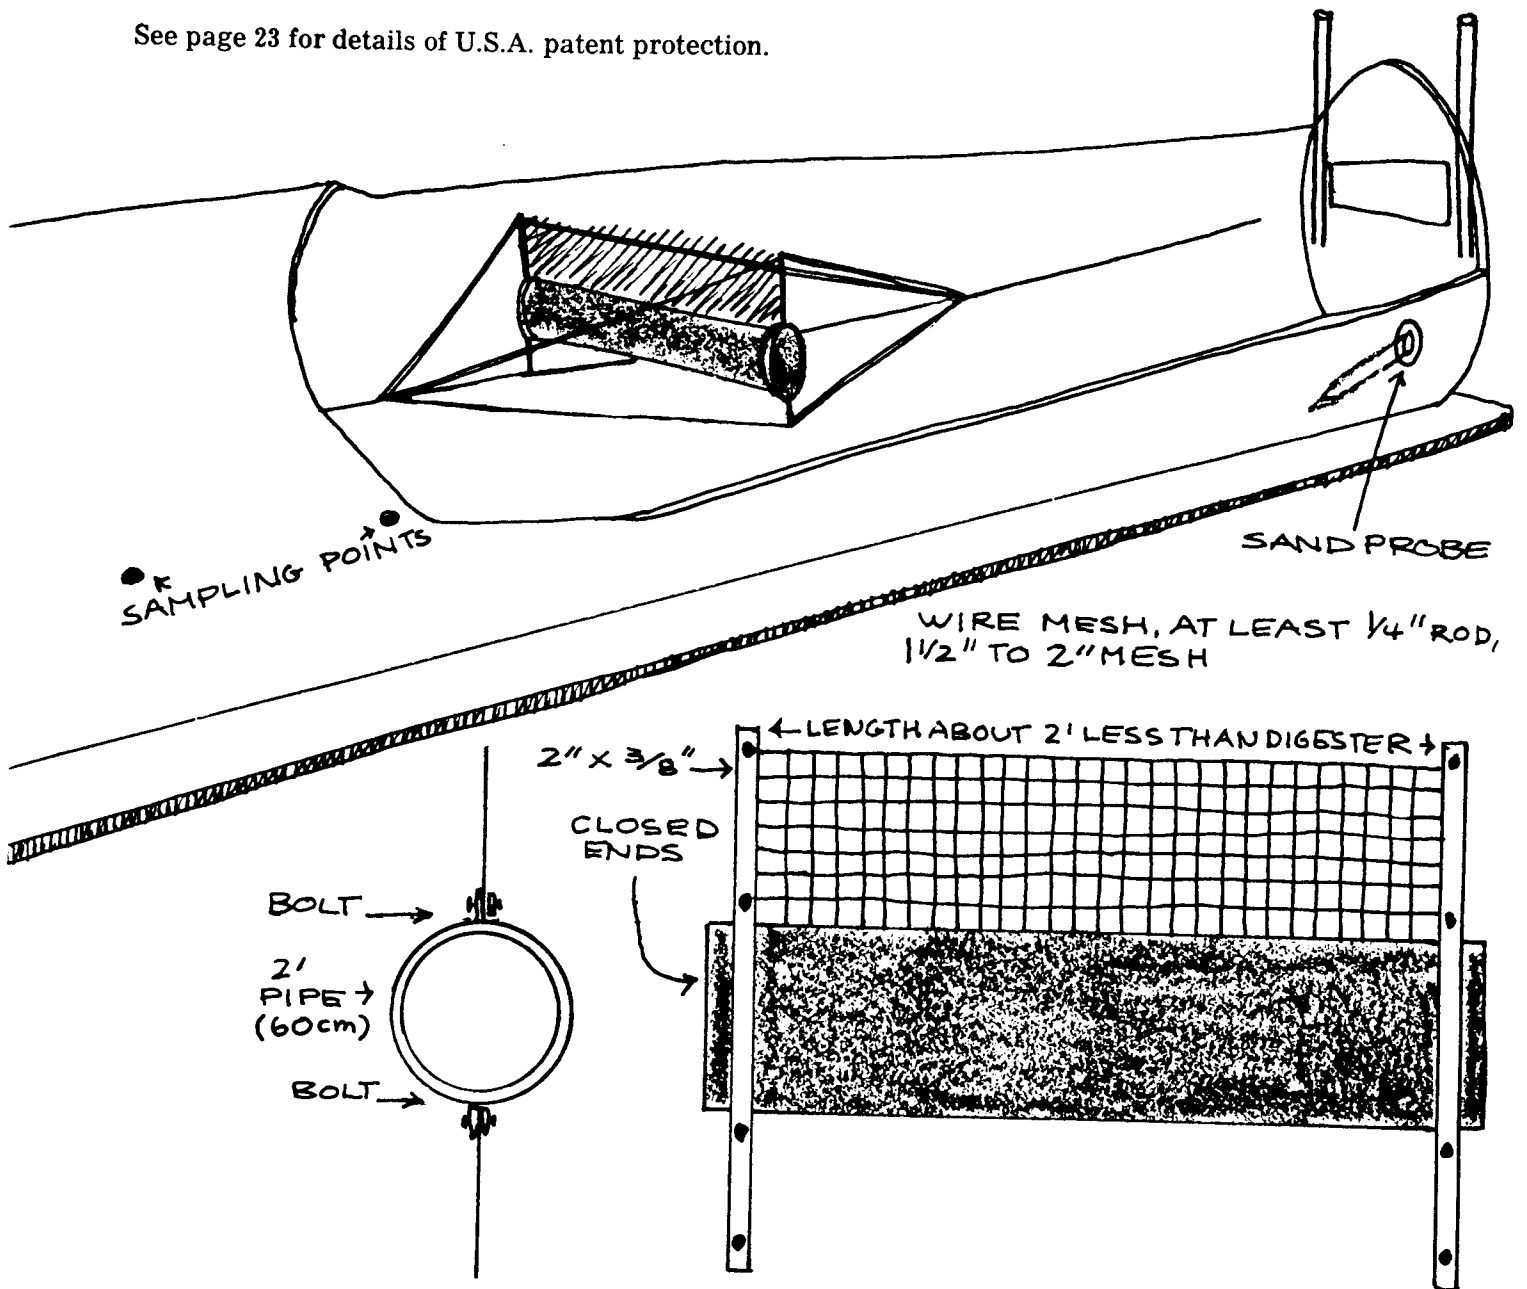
A steel, or steel and concrete, digester small enough to be manufactured and transported to the site in modular sections.
